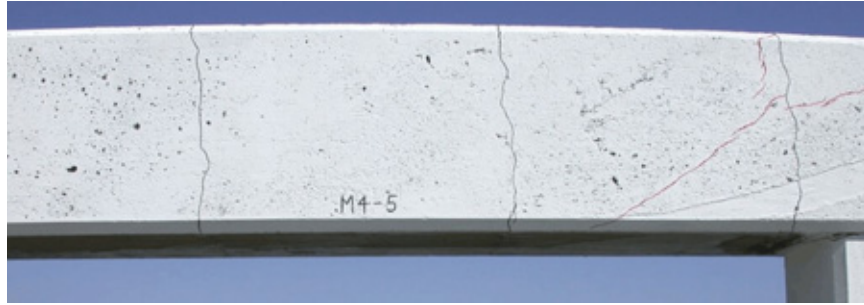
Open Concrete Bridge Rail Damage, Test NIT-1
